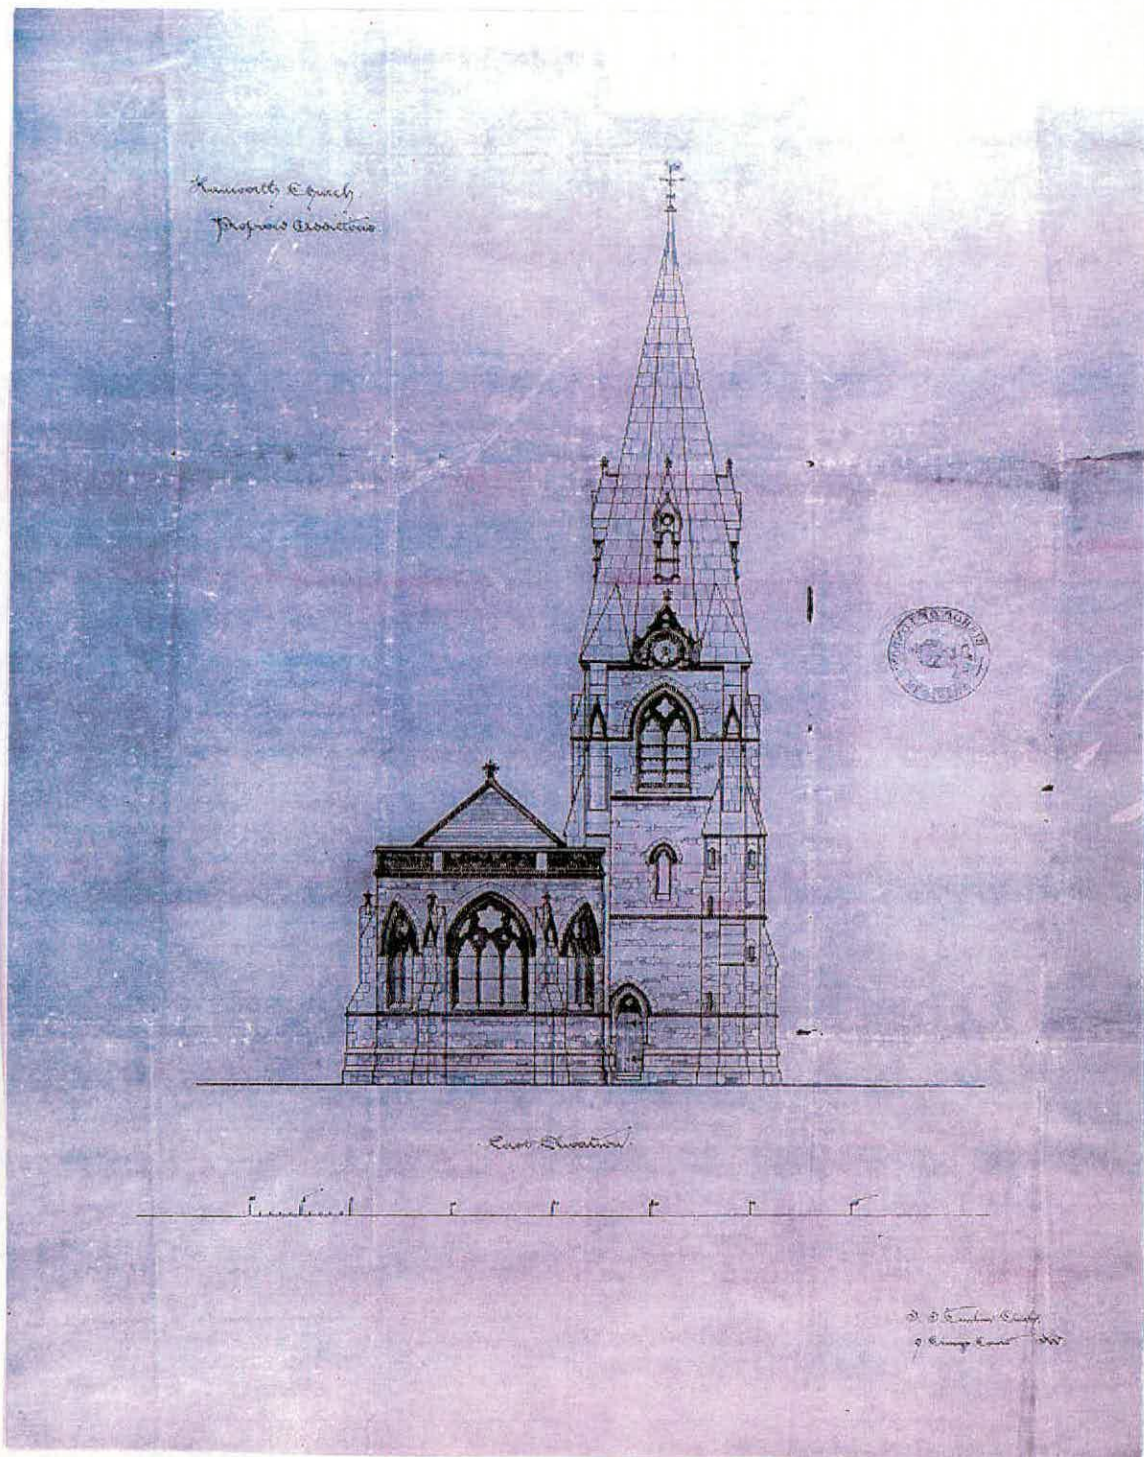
, 'Proposed Additions' to the east elevation of Hanworth Church by SS Teulon c. 1865 (Guildhall Collection)
